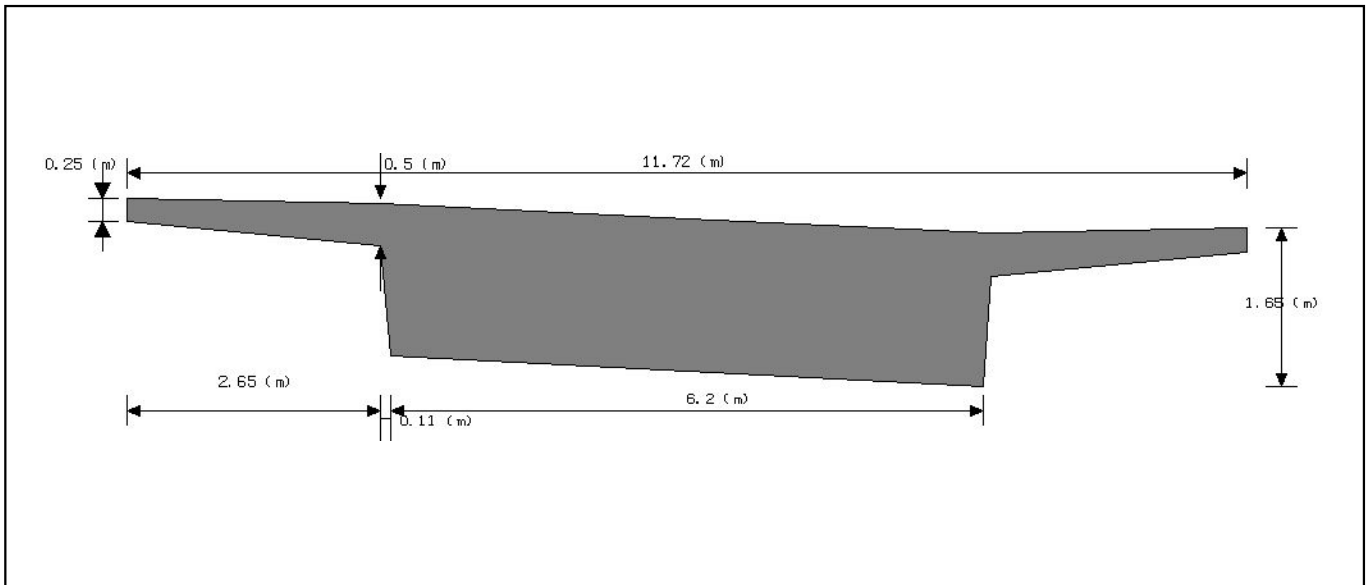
Down station view for Span12 cross section - Station 0.0 .
